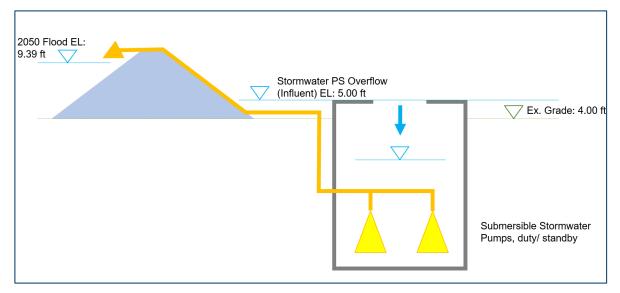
Option 1, Stormwater Discharge Pump Station Concept Arrangement, Section View
